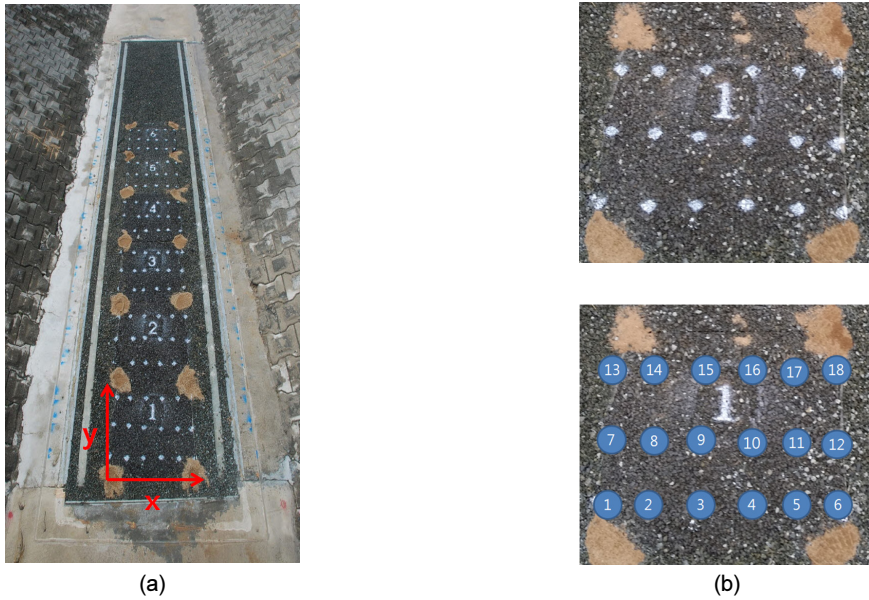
Photographs showing measurement points in the revetment blocks. Top view (a) and detailed view (b).
